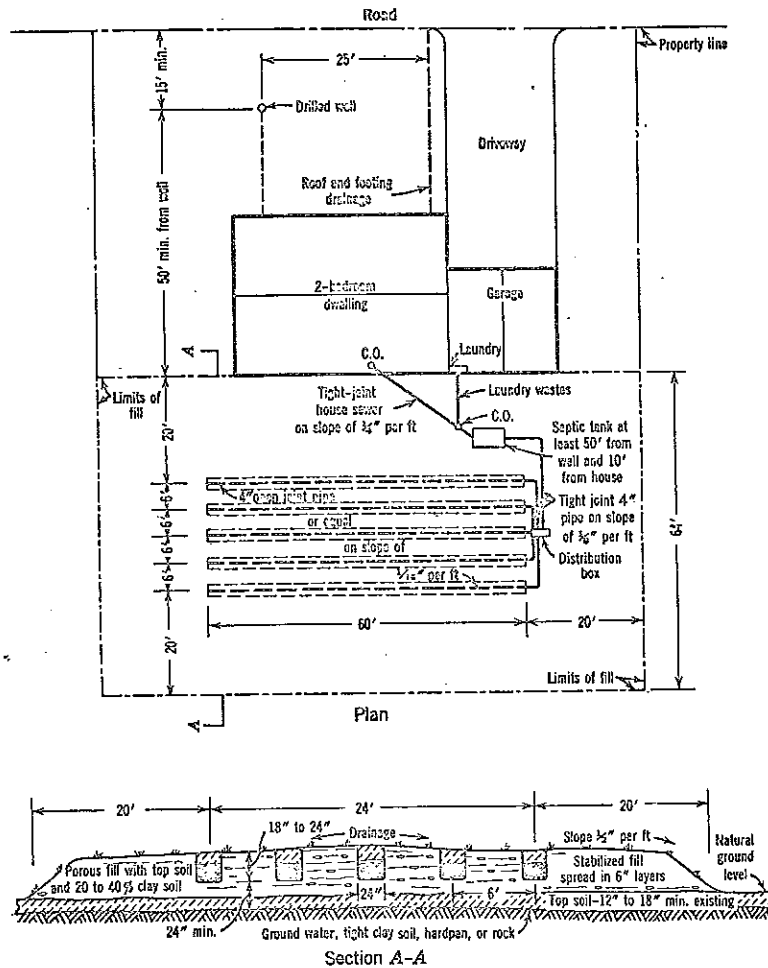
Sewage-disposal system over clay soil or rock. NOTE: First floor and house sewer elevations must be established to provide gravity flow to sewage disposal system. Design basis: 300 gpd and a transvapo-percolation rate of 0.5 gal per trench sq ft per day or $\pm \frac{1}{2}$ pt per sq ft of gross area of fill (64' \times 100').
